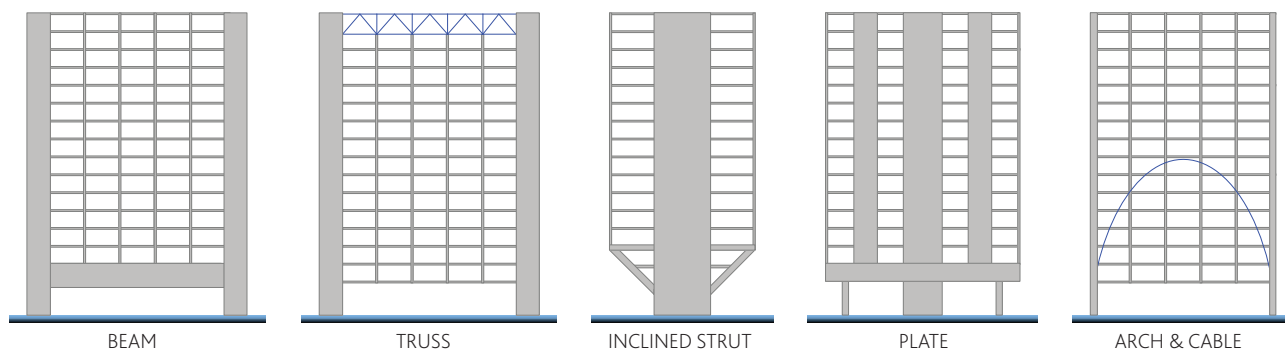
Types of transfer structures – BEAM, TRUSS, INCLINED STRUT, PLATE, and ARCH & CABLE
